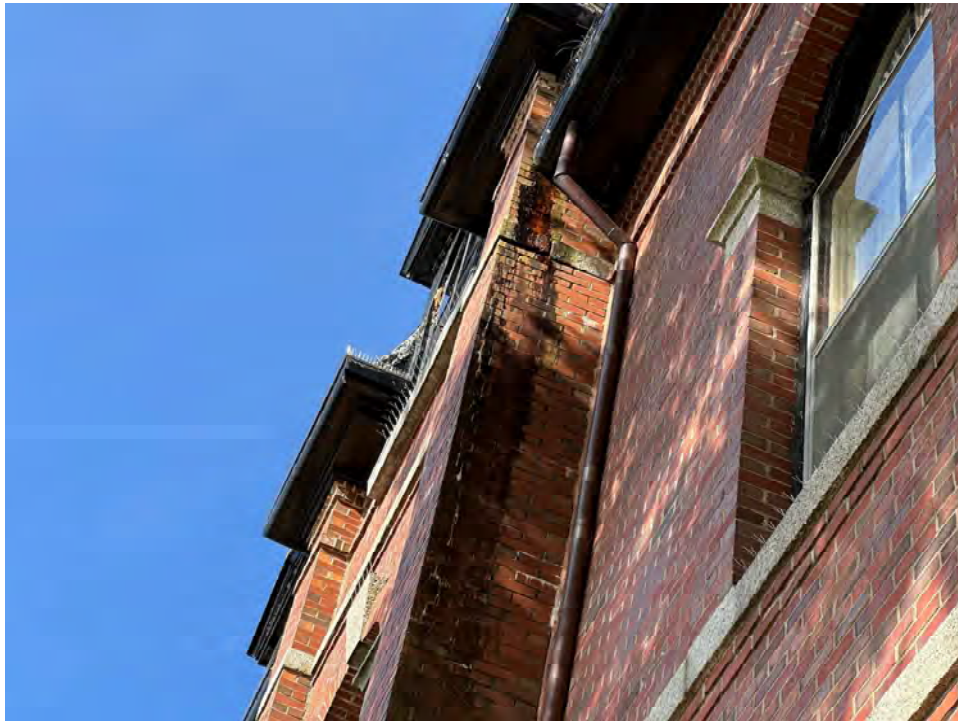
Overview of staining from gutter run-off on south elevation Cumberland Street entrance
